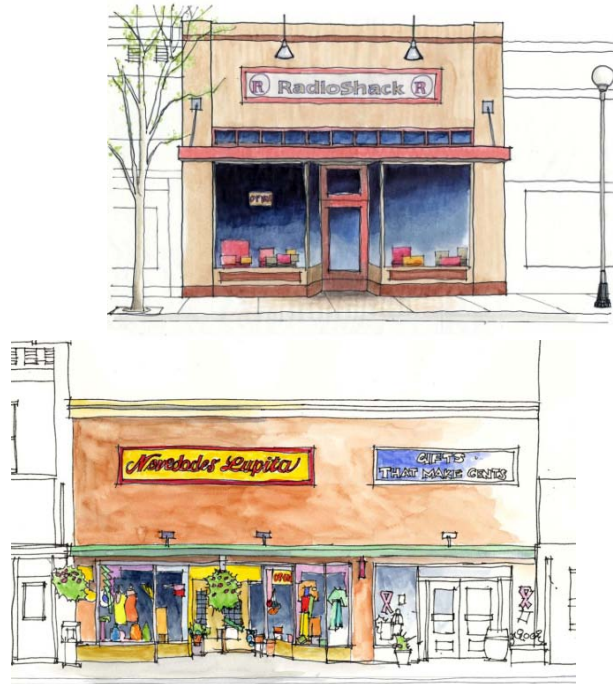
Examples of wall signs located, sized, and shaped compatible with the facade.
